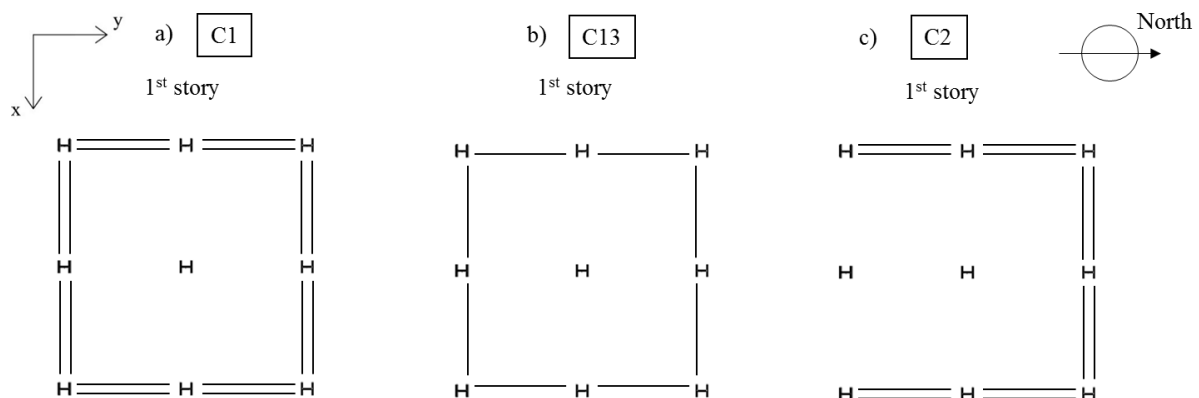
Configurations of the steel frame structure tested under ambient vibrations analyzed in this section: a) undamaged conf. C1; b) damaged conf. C13; c) damaged conf. C2.
